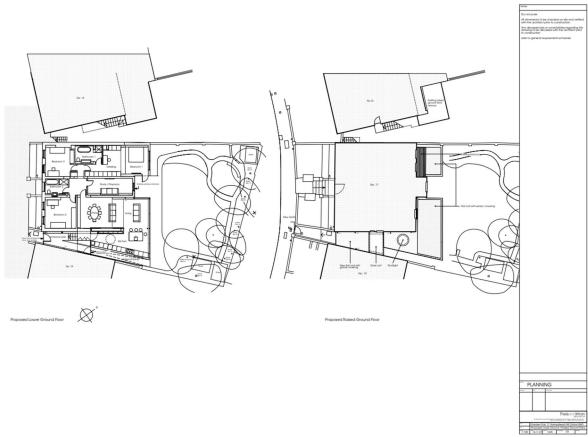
Approved drawings from application 2007/5713/P. These works allowed for additional flank and rear extensions and describe the Lower Ground Floor as is it existed prior to merging with Upper Ground Floor.
